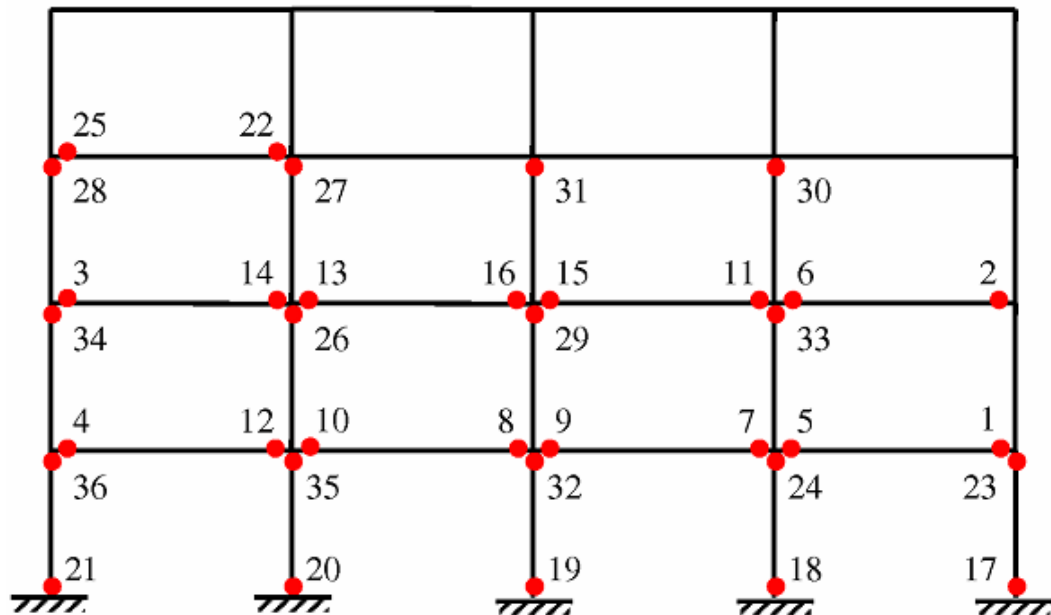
Hinge Formations for Structural Frame without Wall under $0.2N_0$ Axial Load and Nonlinear Geometry
